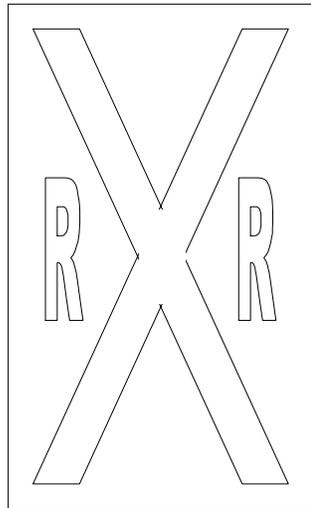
Typical Railroad Crossing Warning on Pavement
